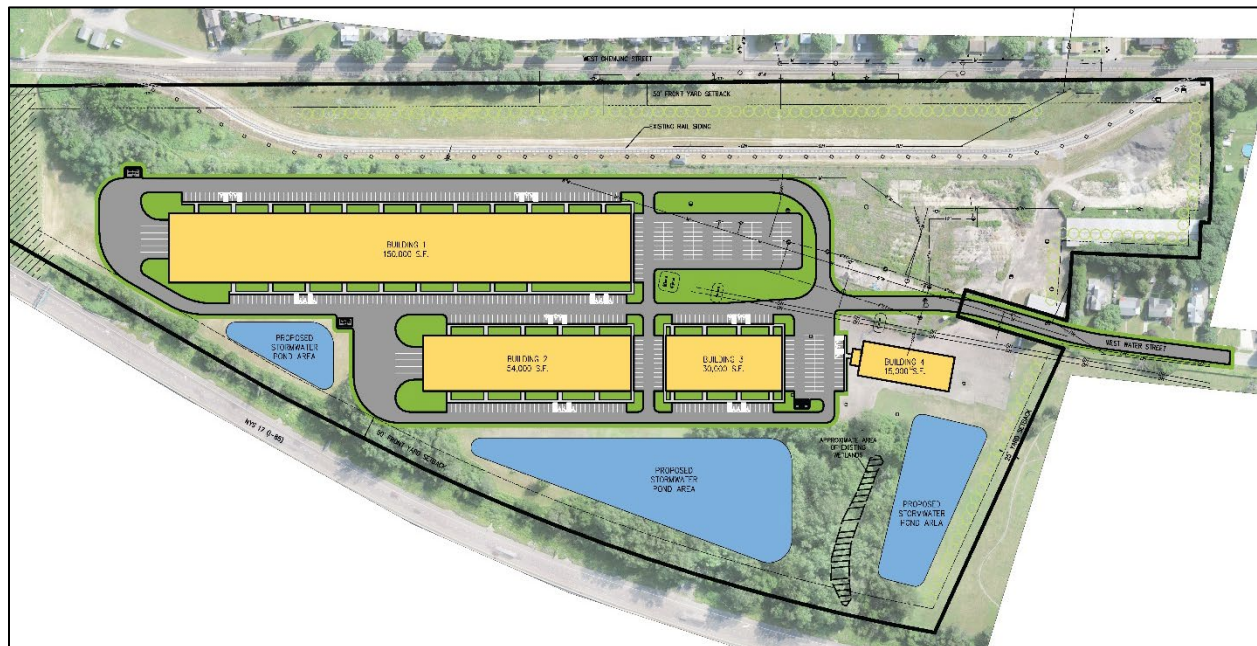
Overall Alternative of Choice Conceptual Site Layout Plan.
